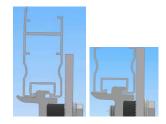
A: FixZ Rail positioned to secure to fasteners
